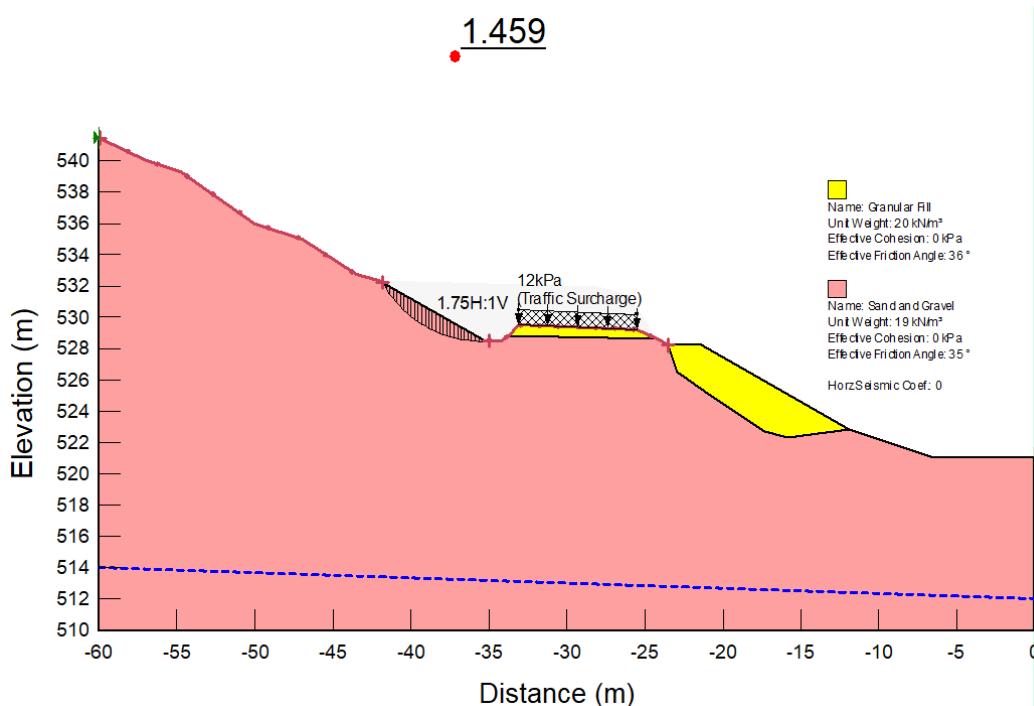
1.75H:1V Cut Slope of Option 2 Design Cross Section at Station 101+40 under Static Loading Conditions.
